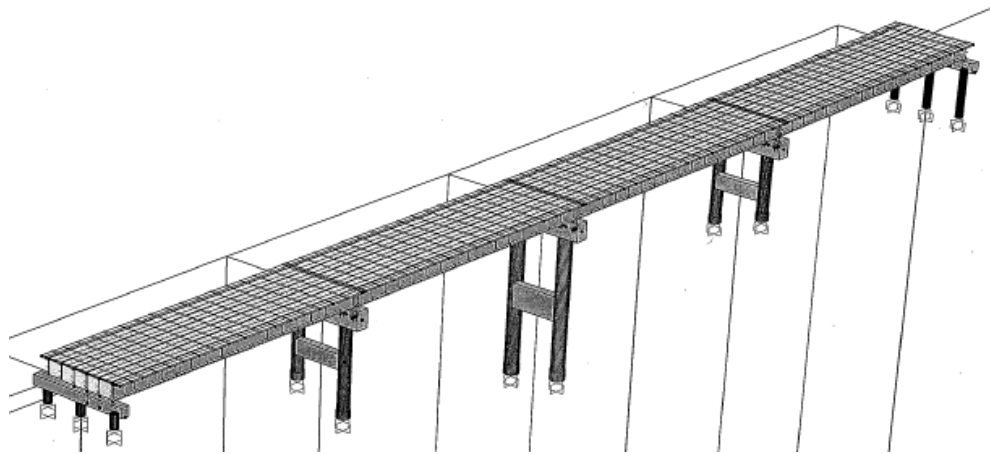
3-D SAP Model of Scarham Creek Bridge
